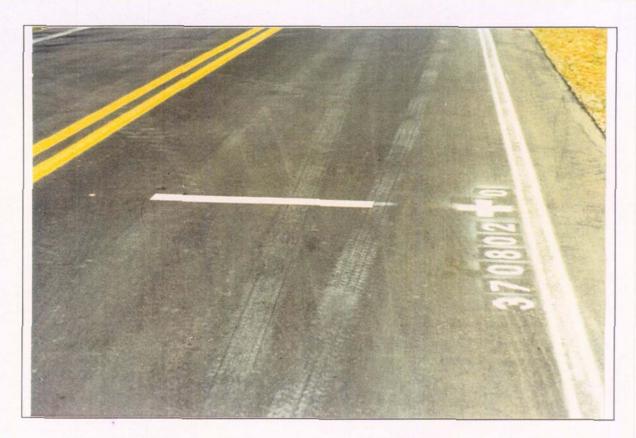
Pavement Markings on Section 370802 Showing Starting Stripe
